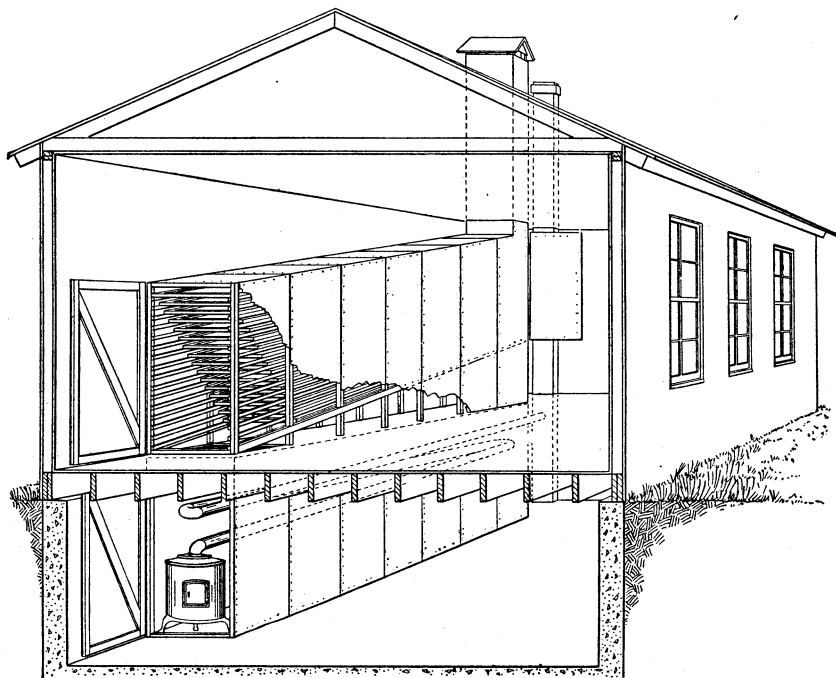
A single-tunnel prune evaporator of standard dimensions.
